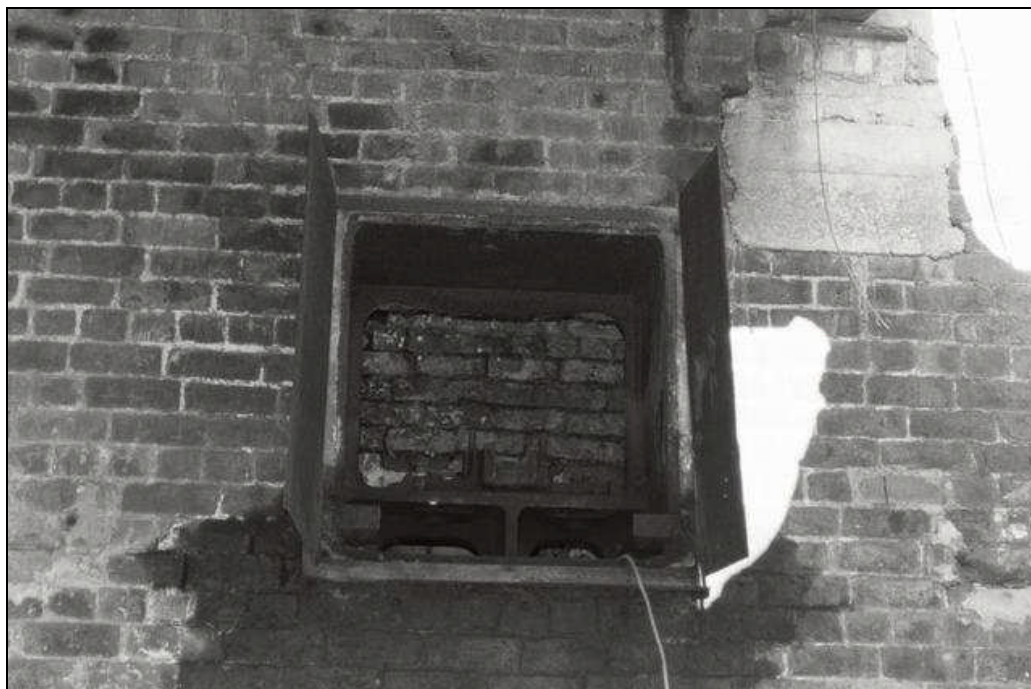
Wall box in eastern shed, internal north elevation, Building C
